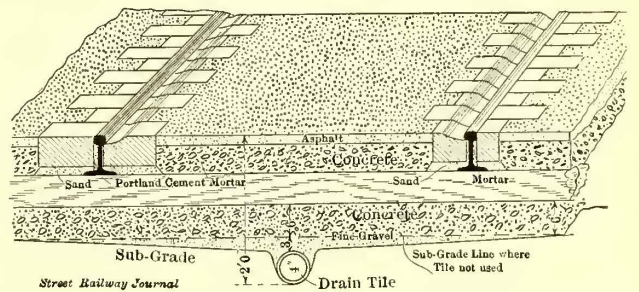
CROSS-SECTION OF T-RAIL TRACK ON N. E. STREET, RICHMOND, IND.
